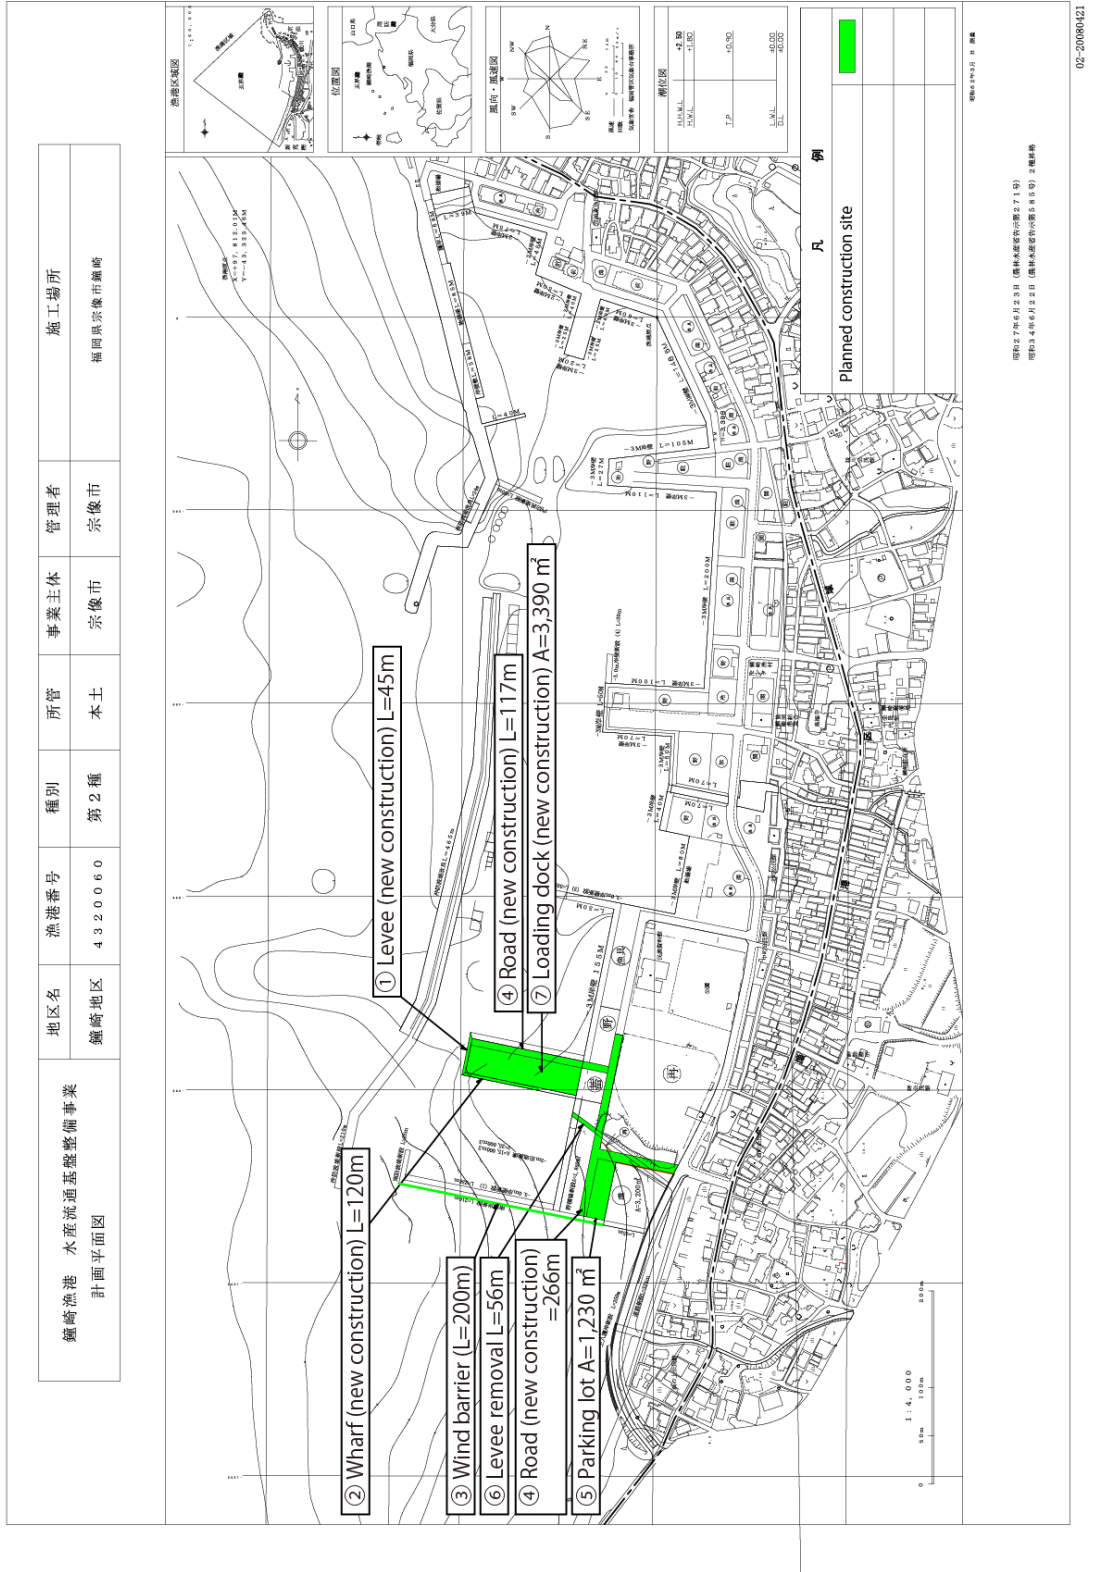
Ground plan for the Kanazaki Fishing Harbor Improvement Project
